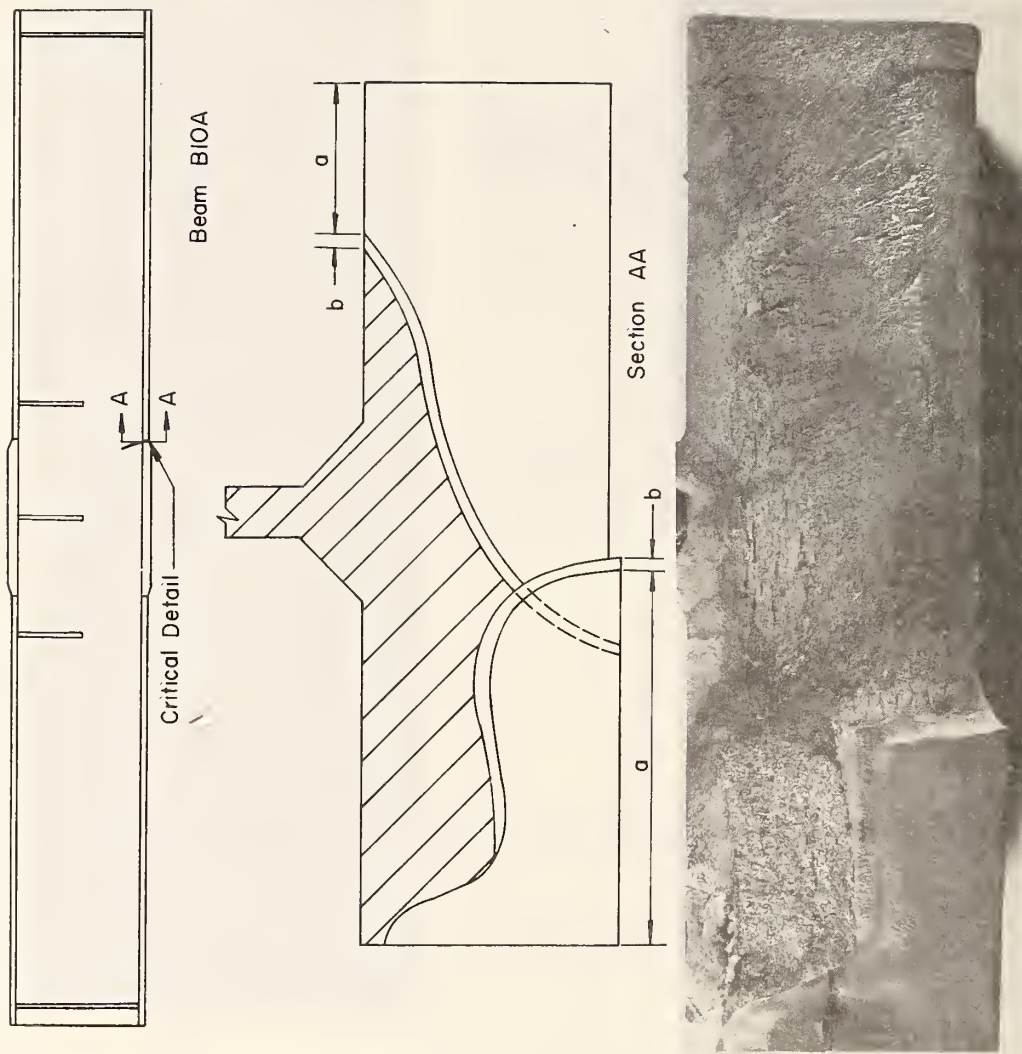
Fatigue and Fracture Surface, B10A (A36)
